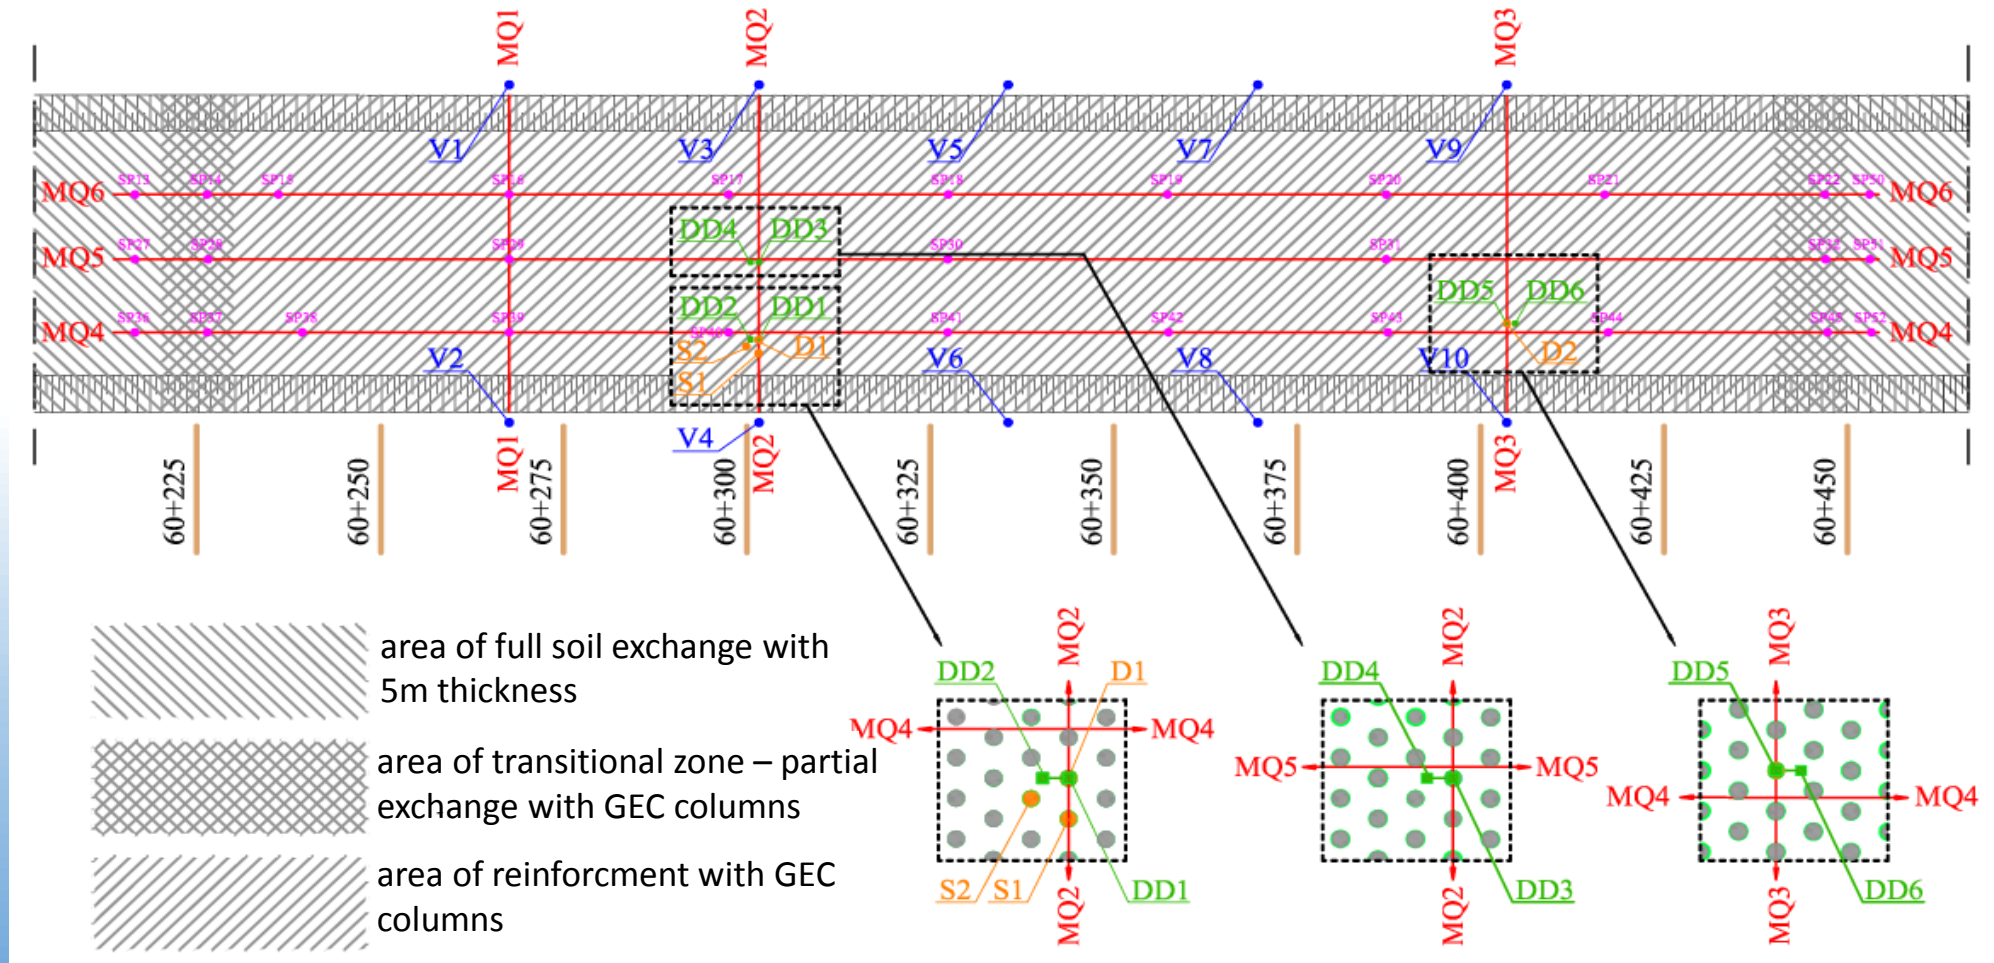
The scheme of soil reinforcement (Łopatko 2016)
